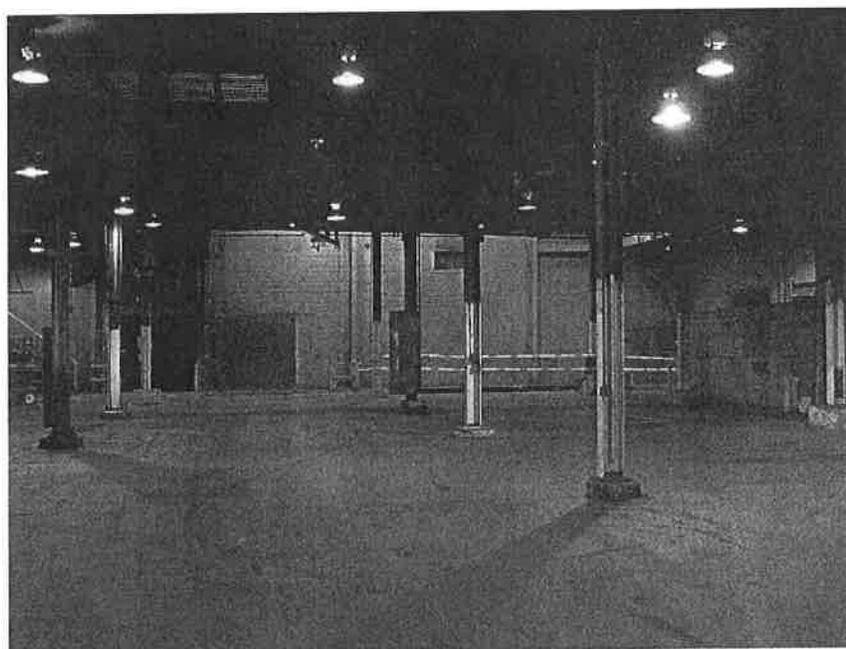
Typical building floor slab. View to north; photograph taken on March 5, 2015.
